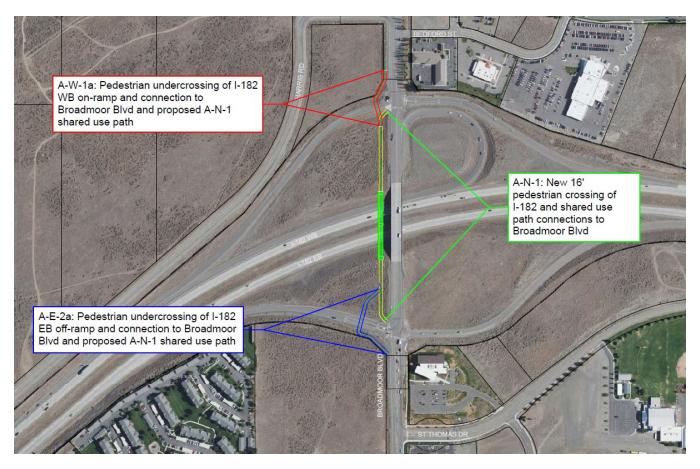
ALTERNATIVES A-N-1, A-W-1A, AND A-E-2A CONCEPTUAL LAYOUTS
